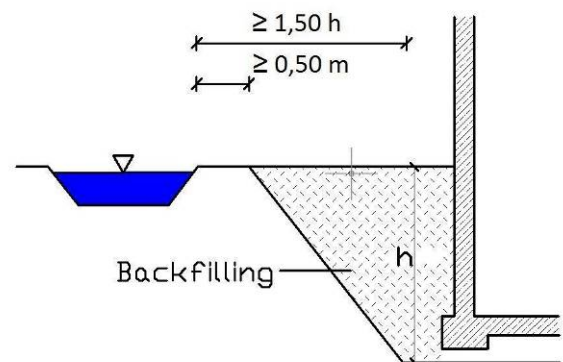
The minimum distance of the decentralized infiltration facilities from building without waterproofing [6]
